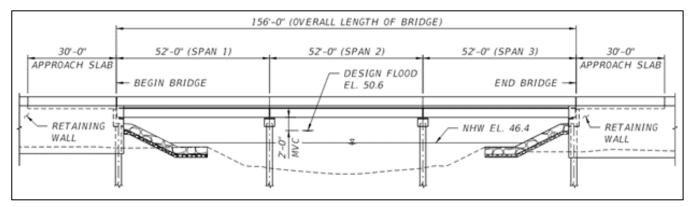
Elevation View of Proposed C-D Road Bridge over Cypress Creek
